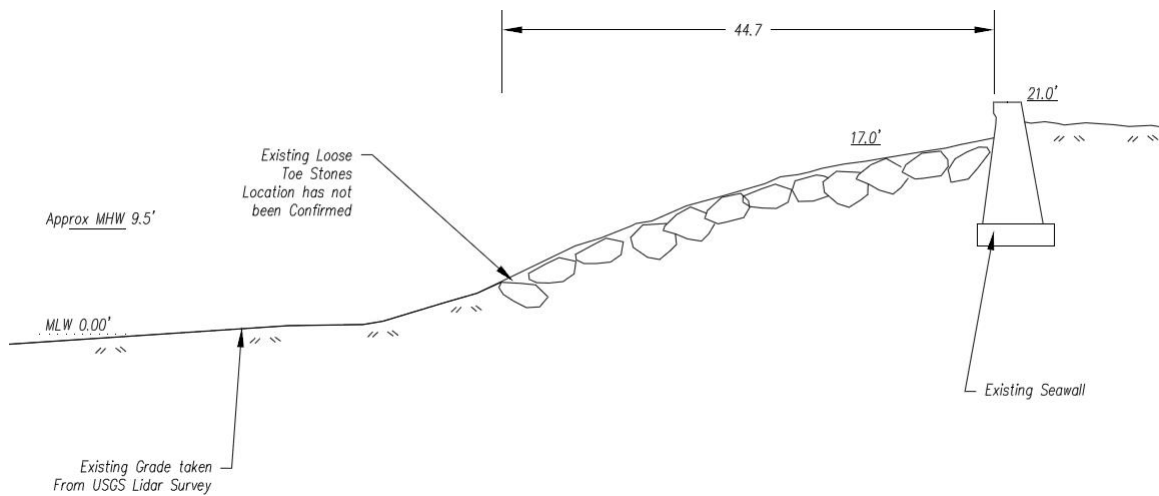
Typical existing seawall and revetment profile for station 10+25 to 16+50.
